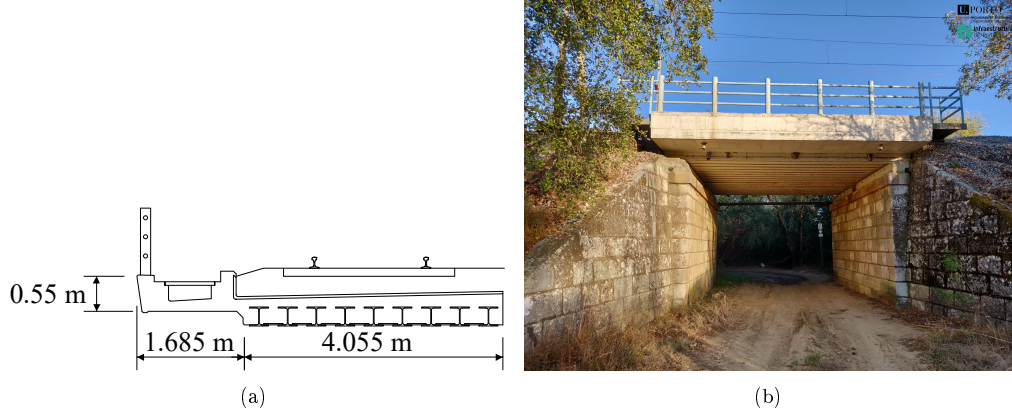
Braço do Cortiço underpass. (a) Cross-section (unit: m); (b) view of the deck.
